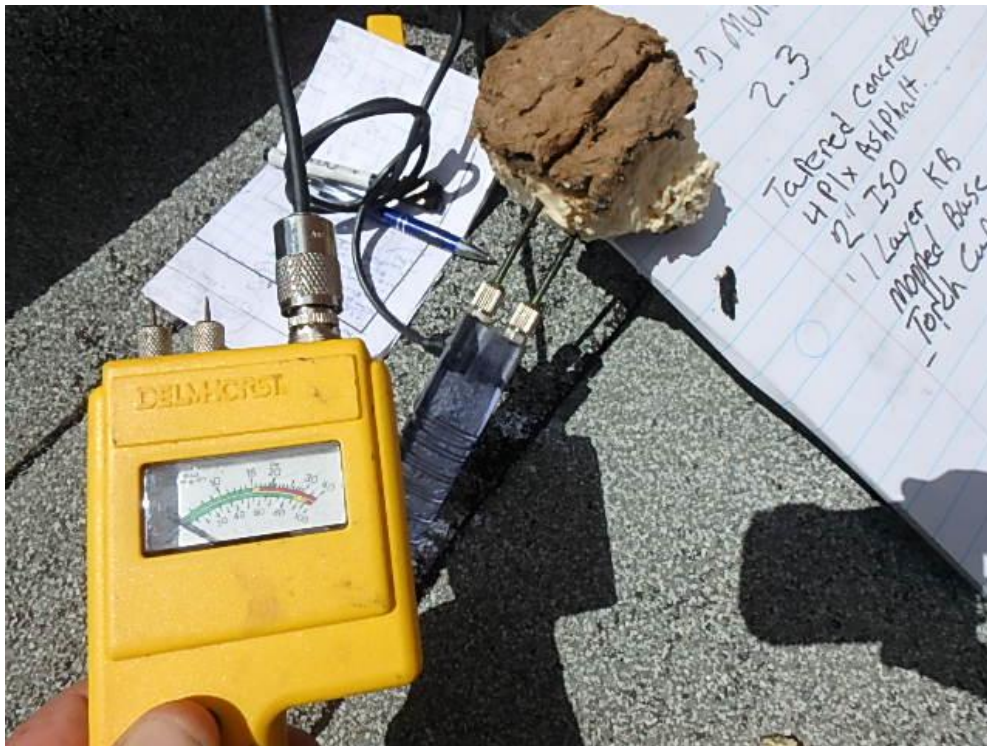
Roof Area 2.1 – Roof insulation moisture test showing high levels of moisture.
